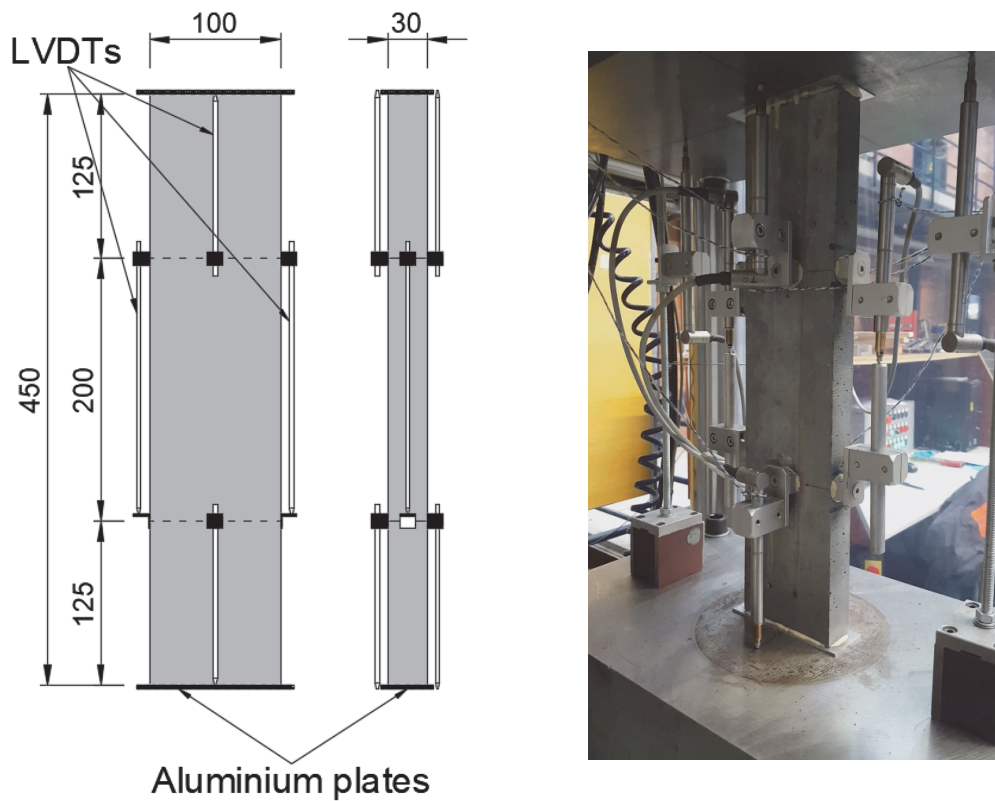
Specimen geometry, measuring devices, and testing set-up.
